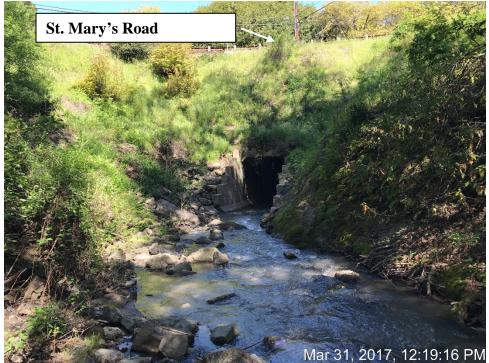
Las Trampas Creek Upstream of Culvert, Facing Downstream (North)
